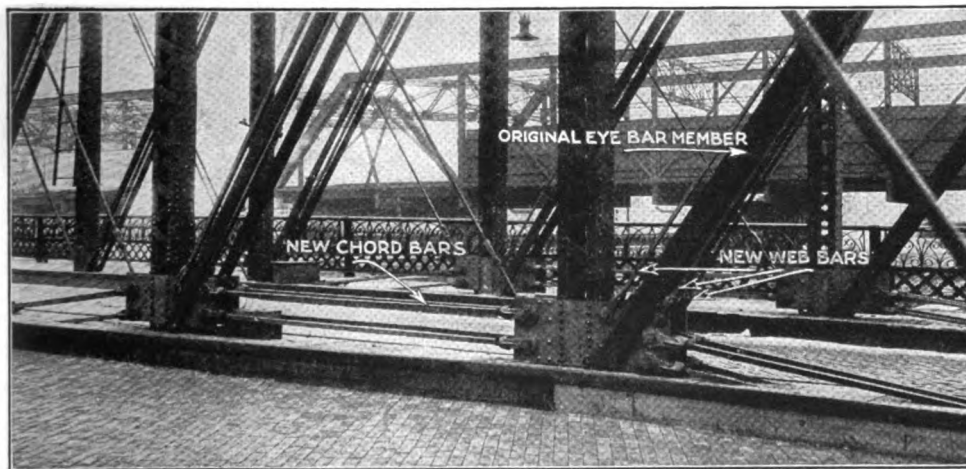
BOTTOM CHORD AND WEB REINFORCEMENT IN MIDDLE TRUSS
